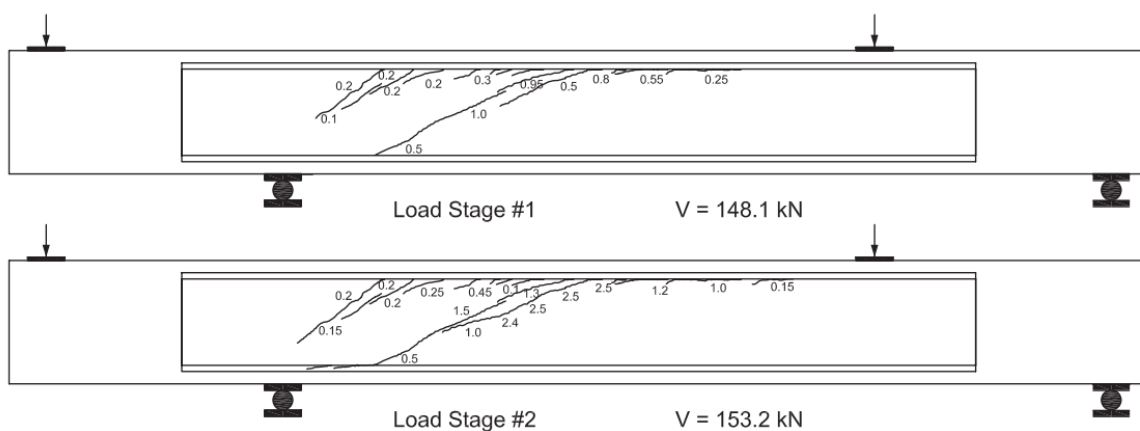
Crack pattern for load stage 1 and 2 [13]
